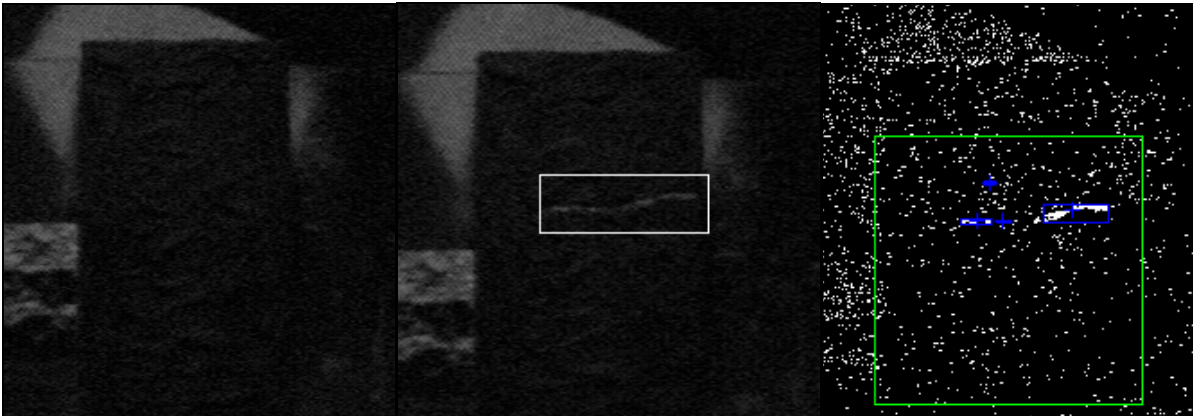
Undamaged slag brick, cracked slag brick, and ROI compare model (luminance of 3 cd/m²).
